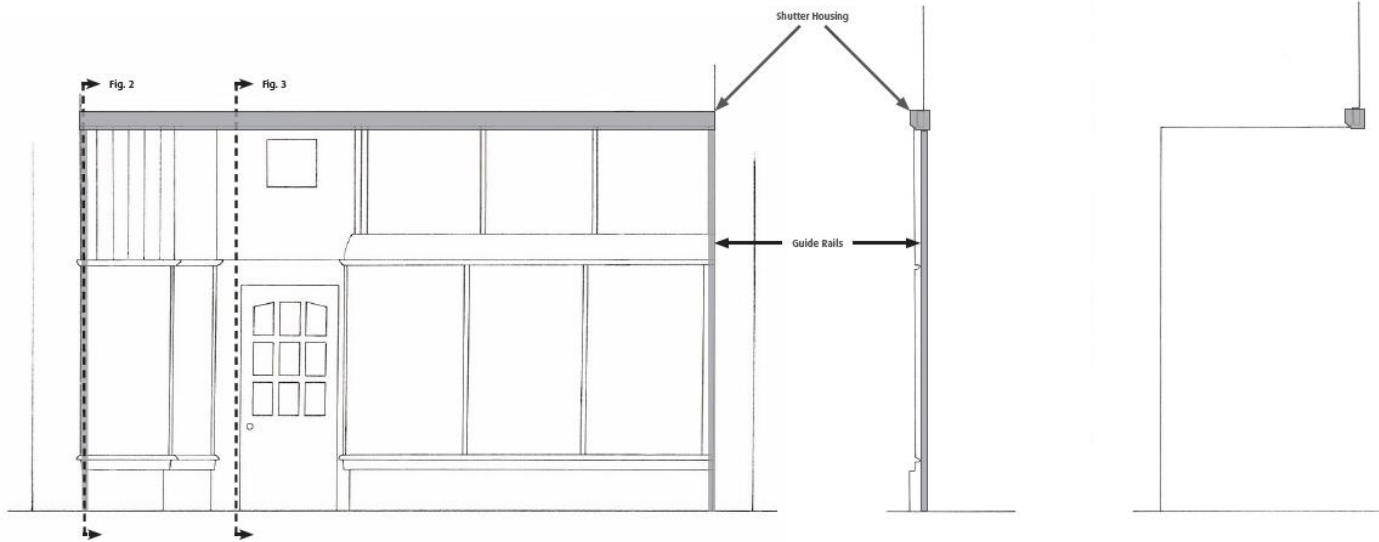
Front Elevation with the Proposed Roller Shutter in the closed position [1:50]
